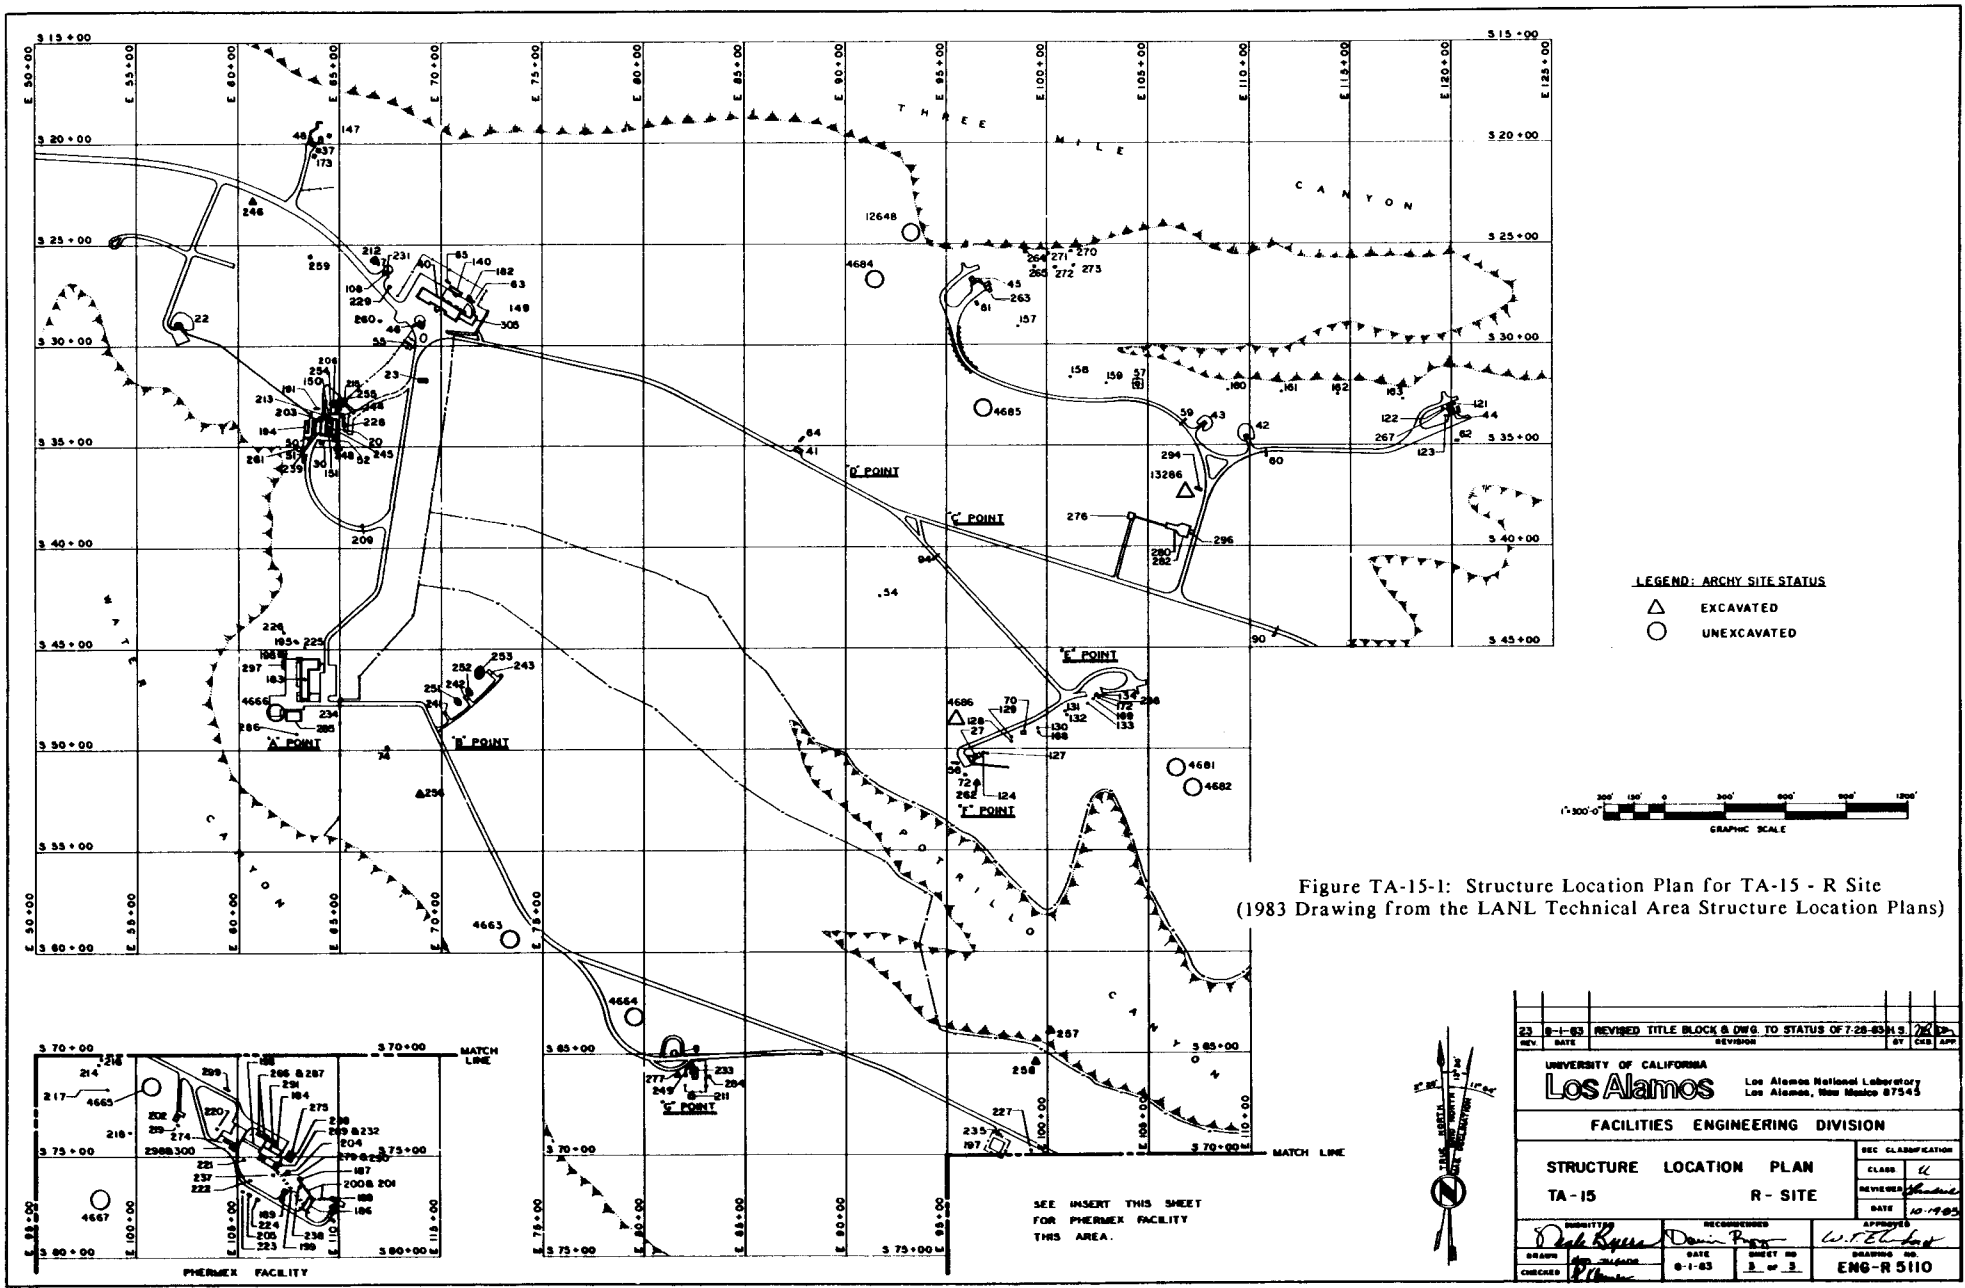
Structure Location Plan for TA-15 - R Site (1983 Drawing from the LANL Technical Area Structure Location Plans)
